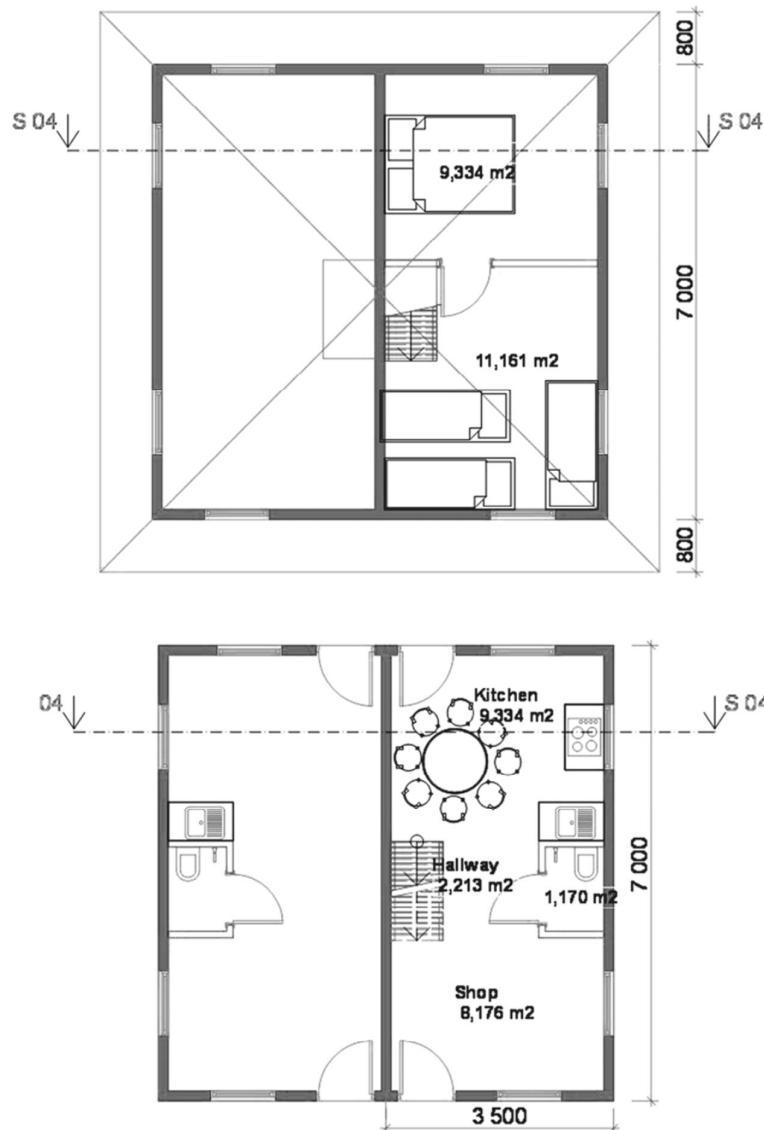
Above: Second floor of Villa Maria. Below: First floor of villa Maria
